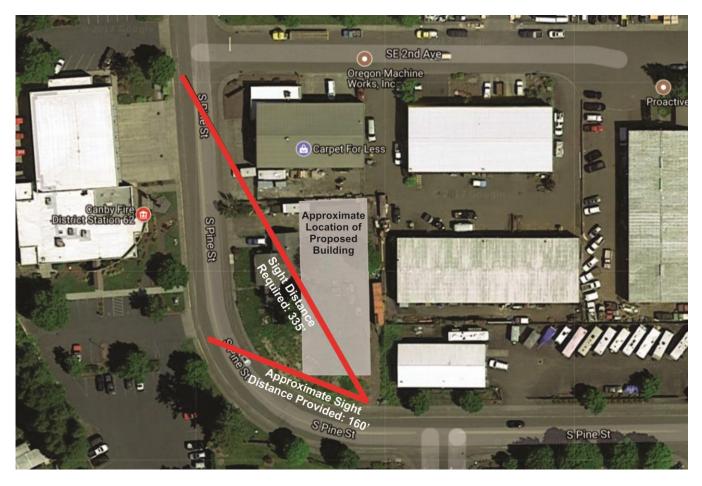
Preliminary Sight Distance Evaluation for an Access on the Southeast Corner of the Site
